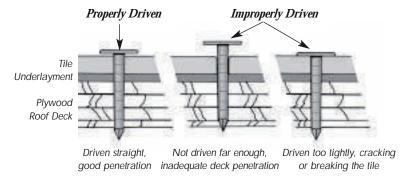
Proper Nailing Techniques for Plywood Deck
